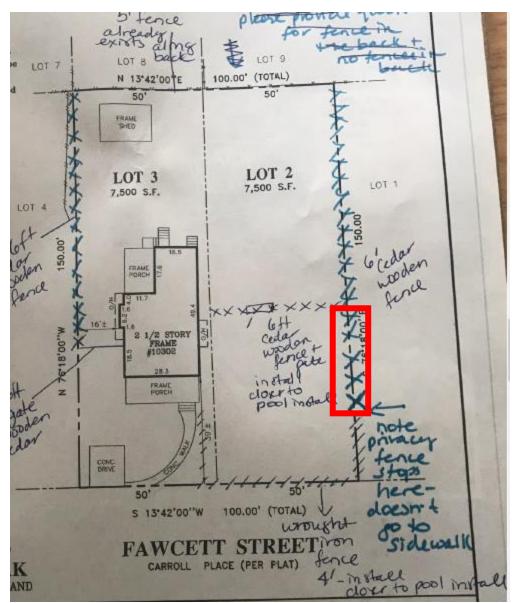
Site plan showing the location of the proposed fencing. The fence subject to Staff's recommended condition is outlined in red.
